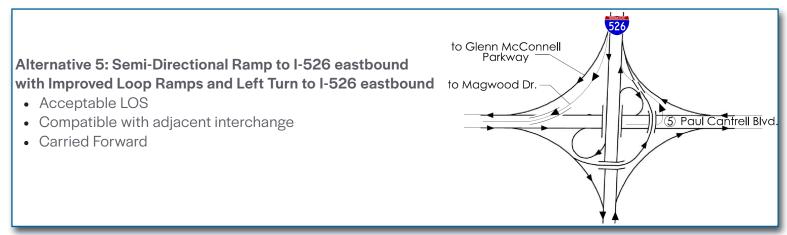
I-526 at Paul Cantrell Boulevard Alternative 5
